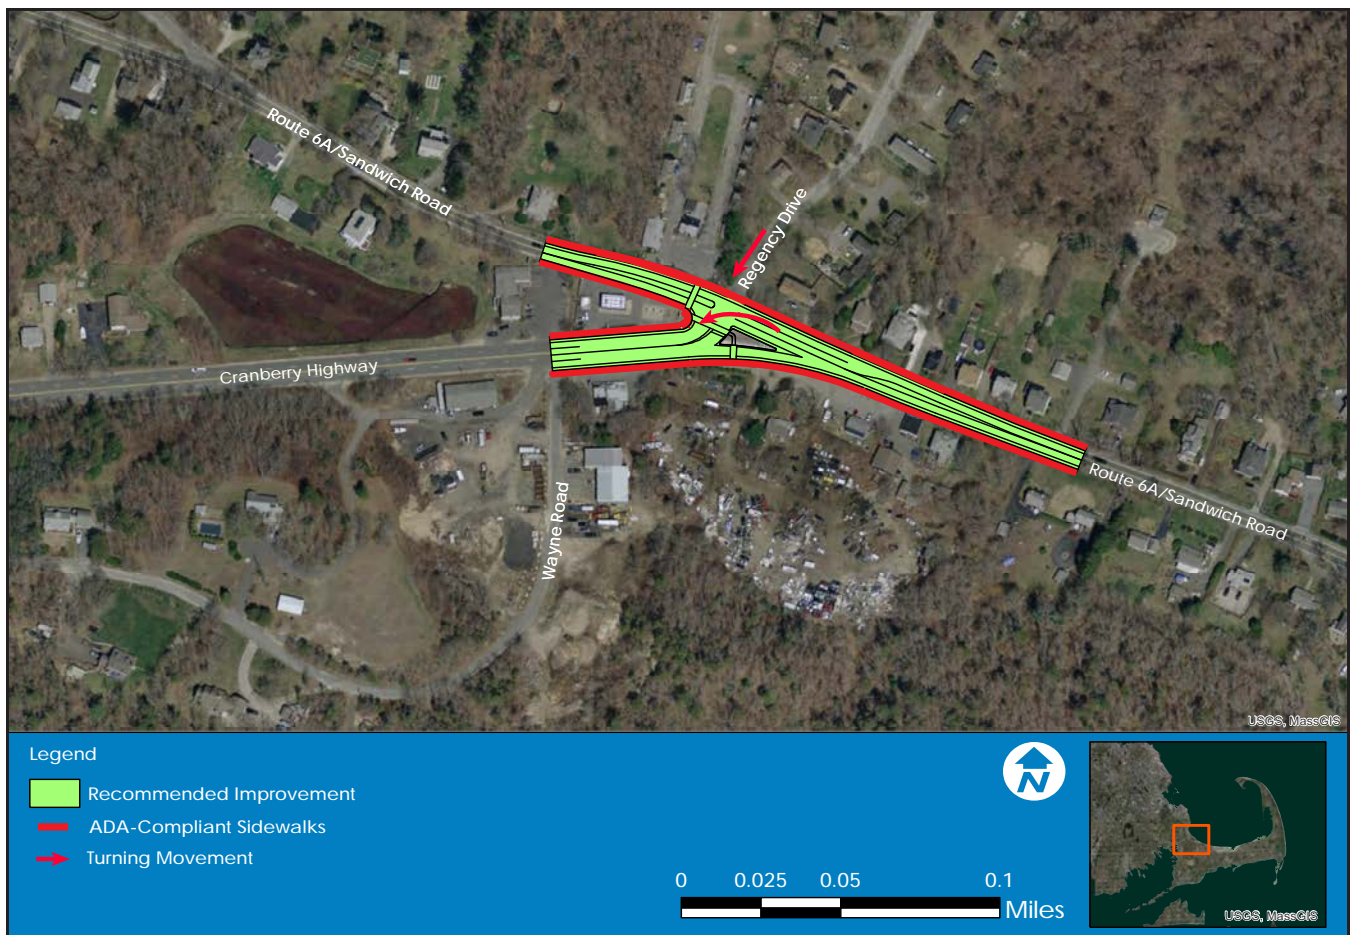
Route 6A (Sandwich Road) at Cranberry Highway
